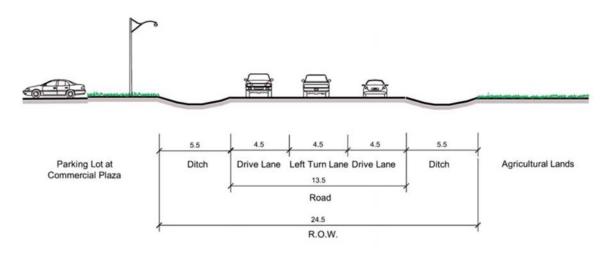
WOODBINE AVENUE, KSP EXISTING CROSS-SECTION
